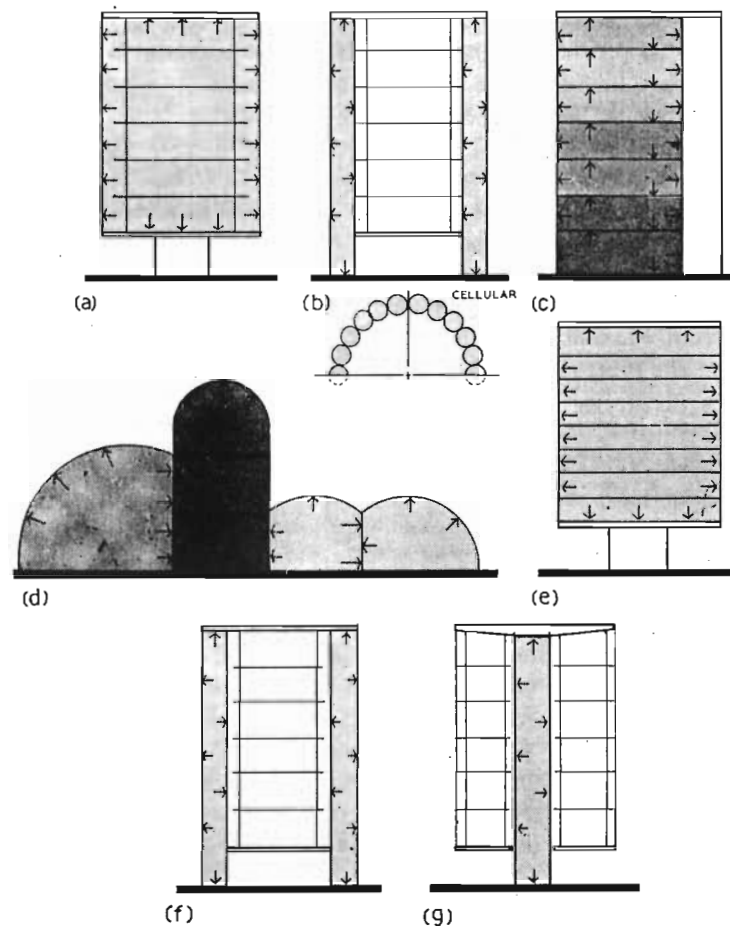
Principal fluid-supported building types; (a) single-skin with cables; (b) double-skin cellular; (c) single-skin multi-cellular; (d) multi-cellular multi-enclosure; (e) single-skin rigid membrane; (f) double rigid-flexible cylinders; (g) high pressure central core.
